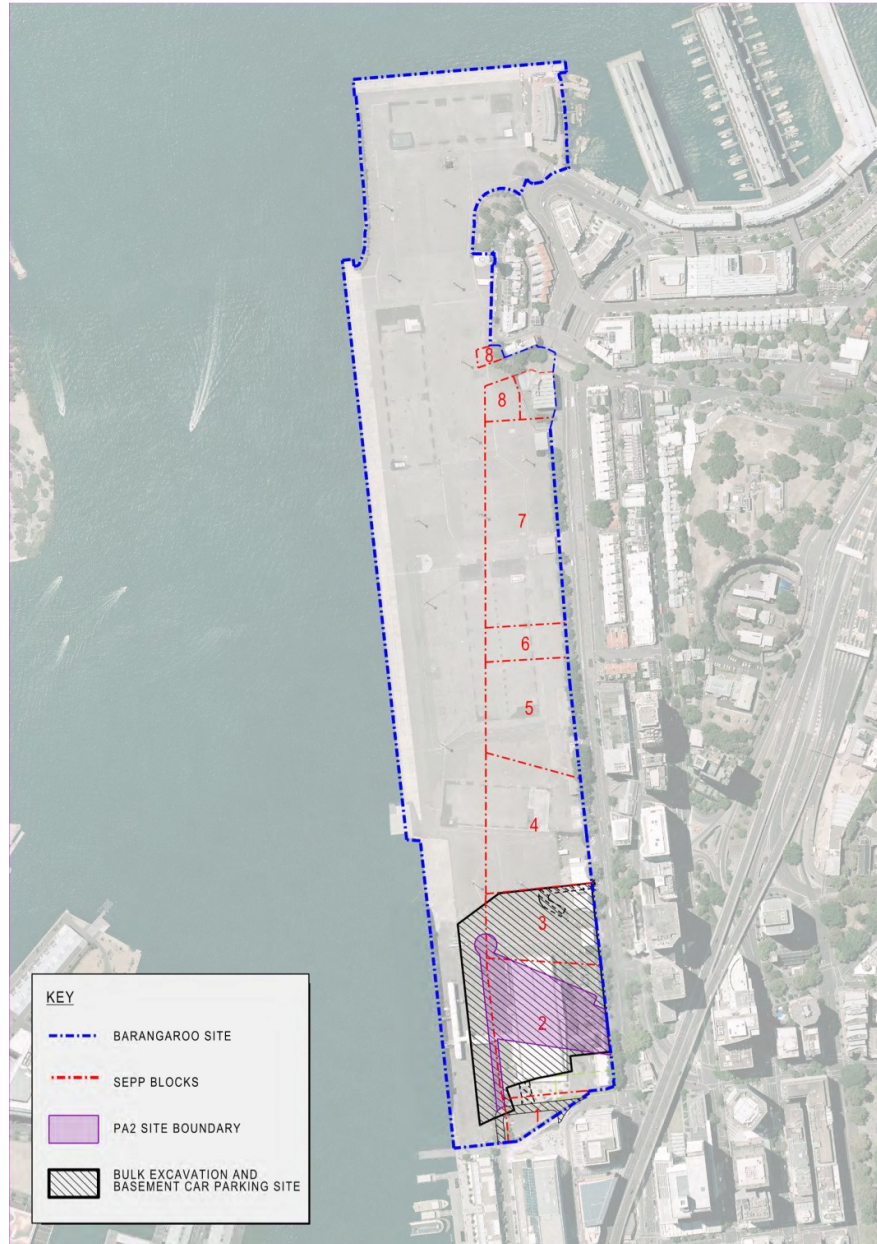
C4 Commercial Building Project Application (MP10_0025) Aerial Site Location Plan
